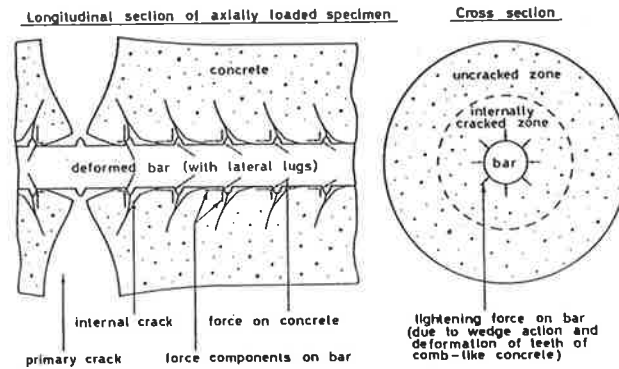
Cracked region around reinforcing steel, (a) longitudinal section; and (b) cross-section (Goto,1971)
